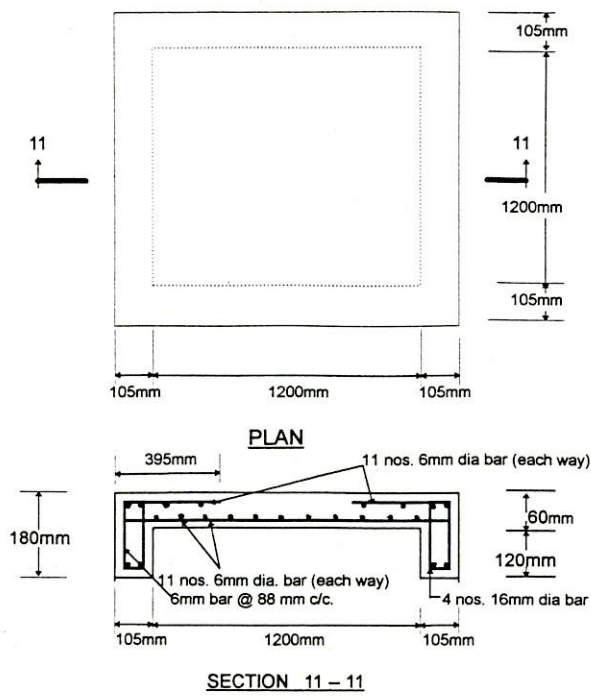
(a) Plan (b) Section and reinforcement details of SLAB 11
